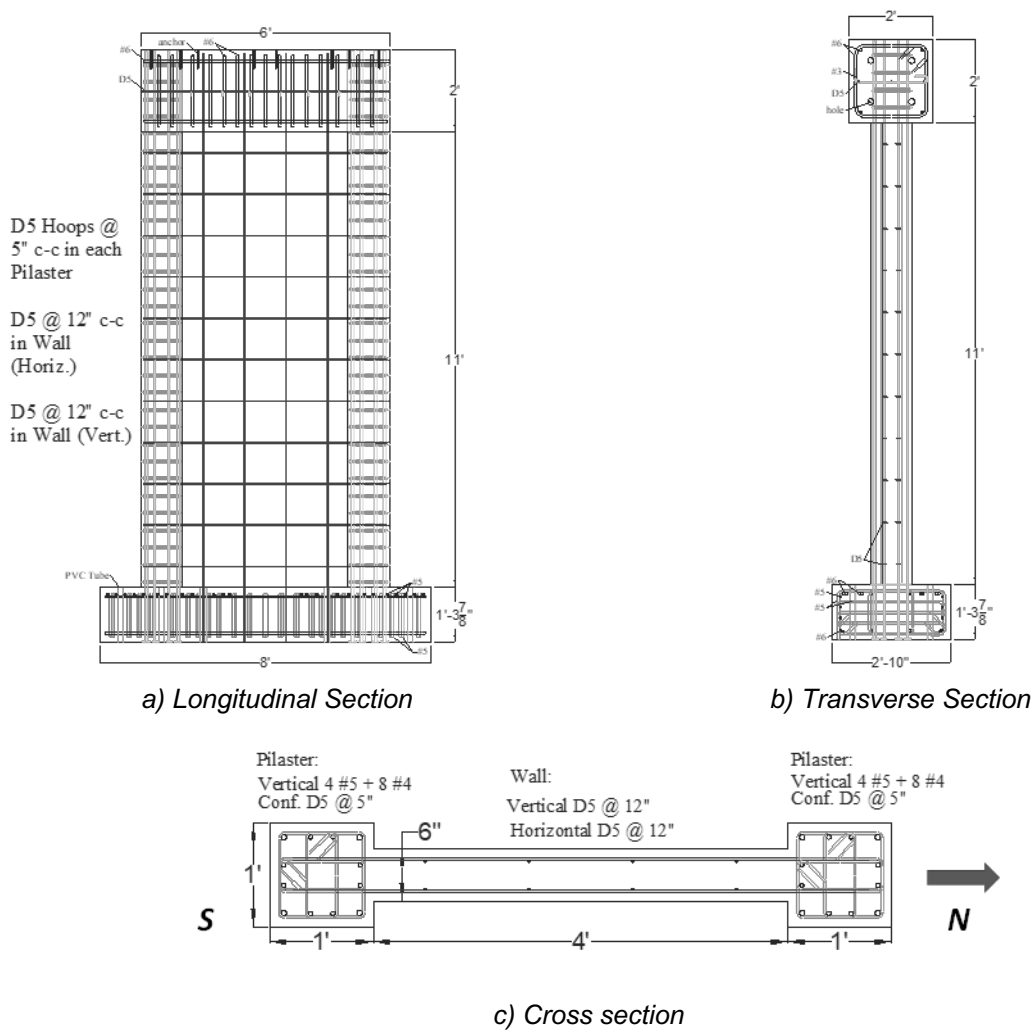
Configuration of Reinforced Concrete Wall (Note: 1 in. = 25.4 mm).
